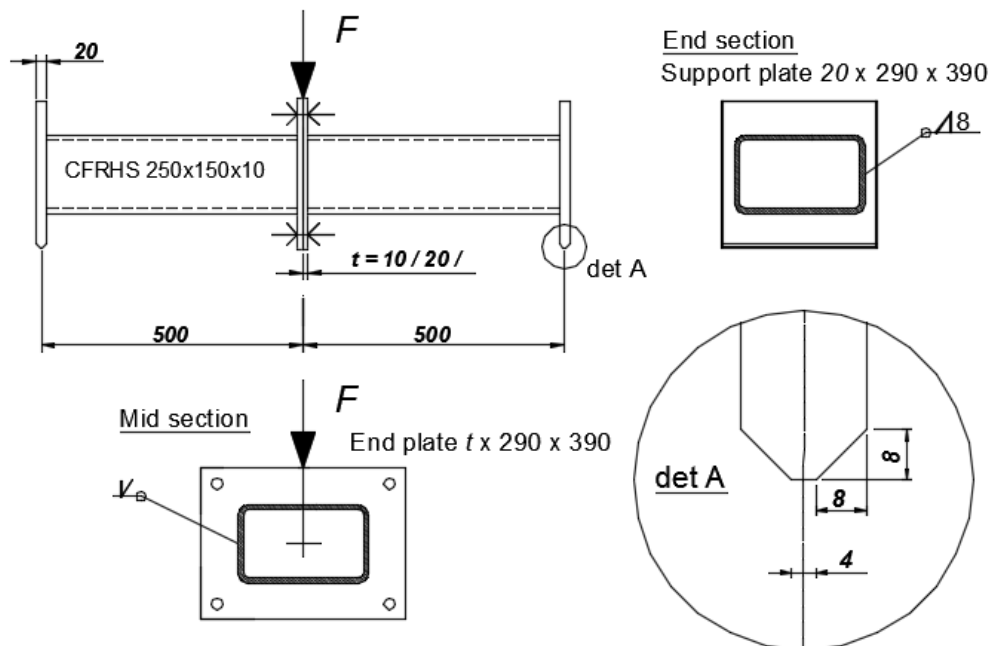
Specimen in the biaxial and weak axis bending test. Layouts of the end plates are given in Figure 3-4.
